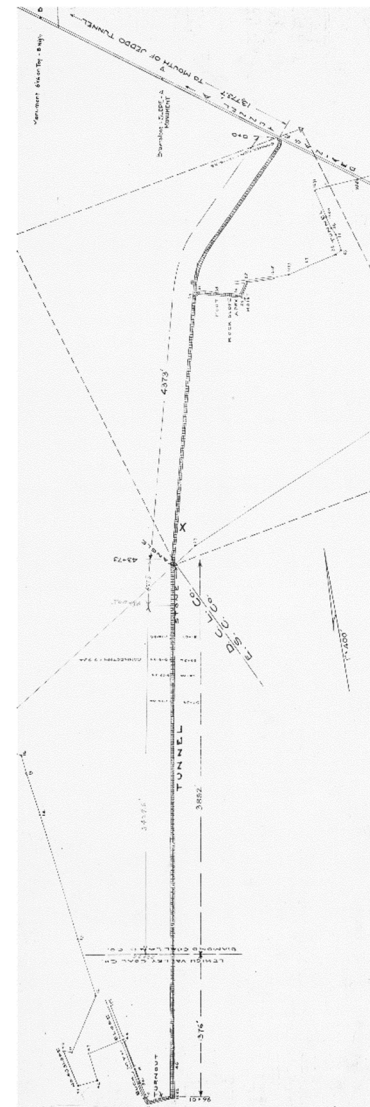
Planview of Tunnel X looking north showing the connection with Tunnel B
